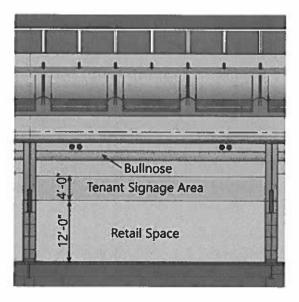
B - ENLARGED RETAIL FACADE AT HUB
